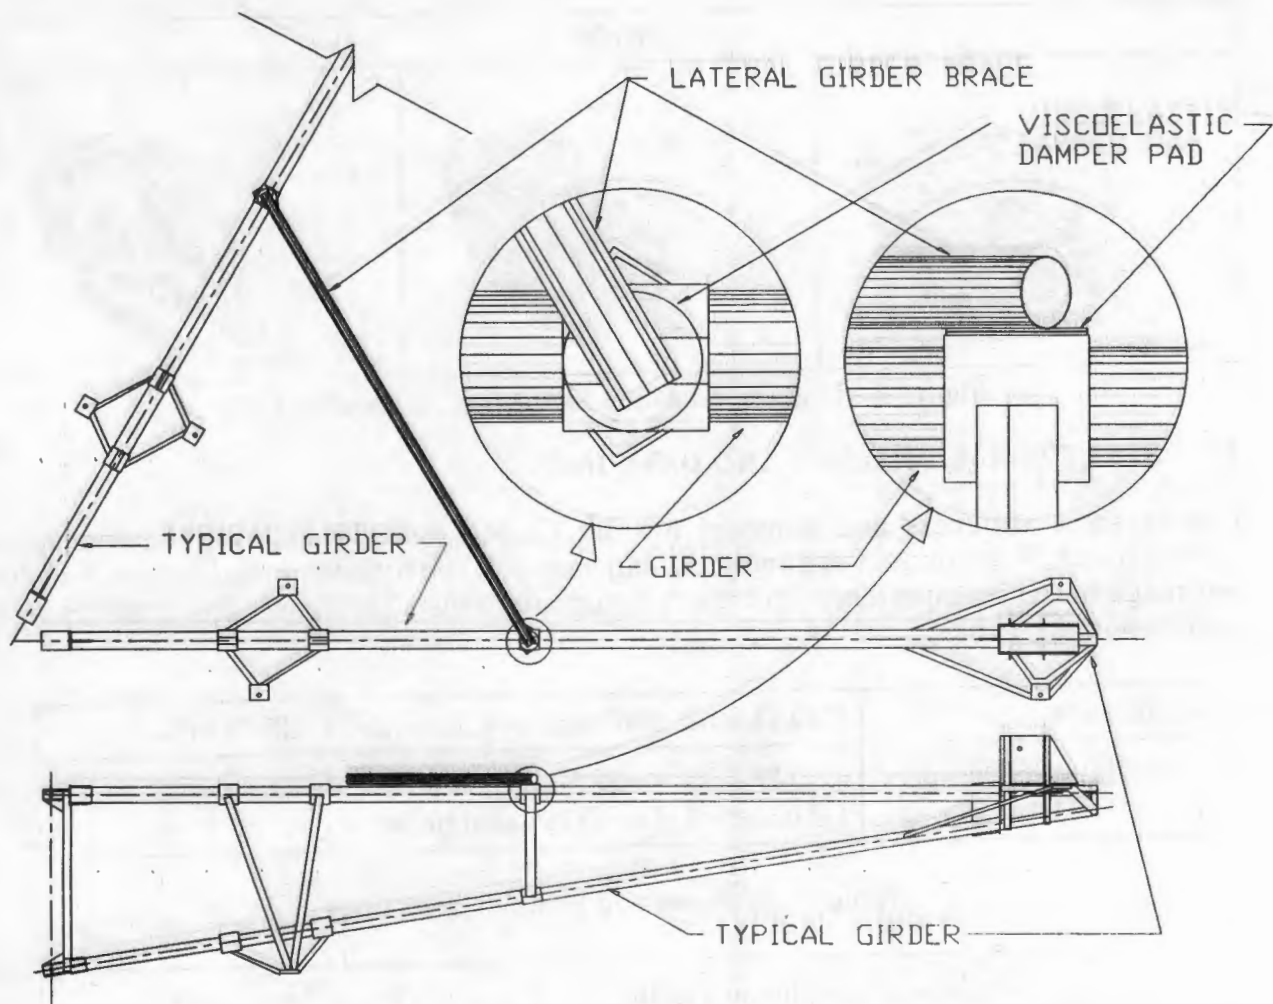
Stiffening & Damping of Lateral Modes in the Girders
